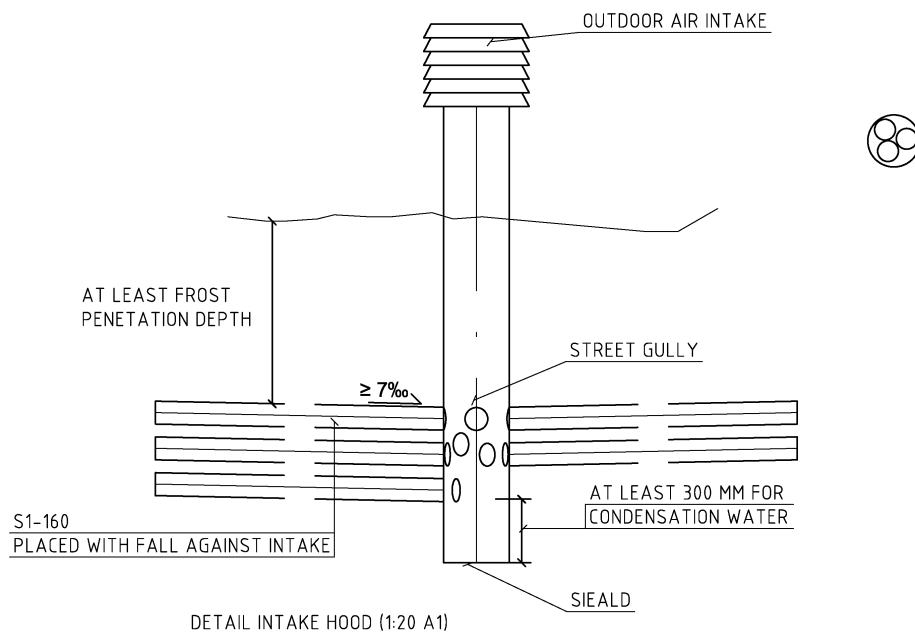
The detail drawing shows a design of an intake hood for a ground duct in smaller buildings. (Berggren, 2022).
